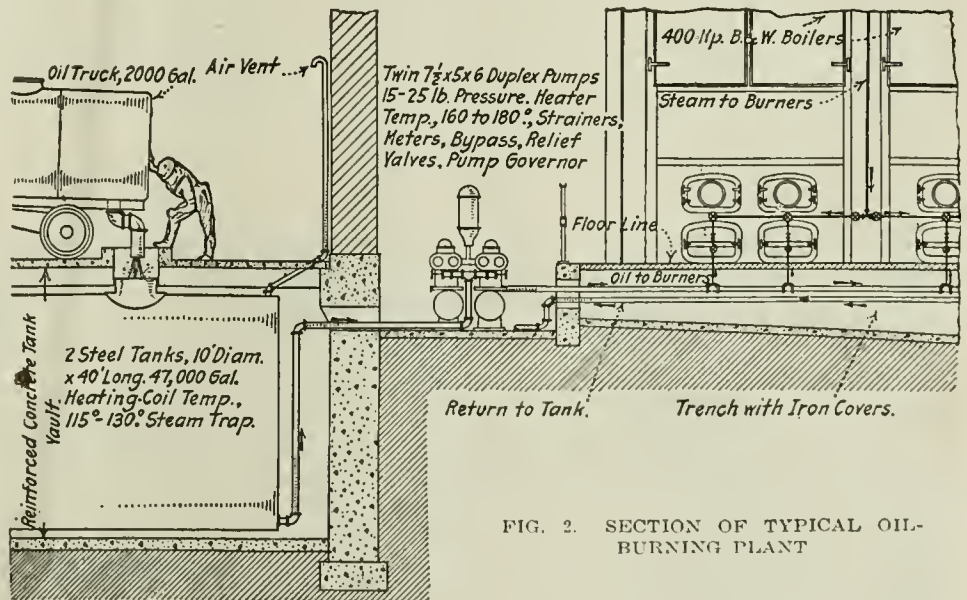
SECTION OF TYPICAL OIL-BURNING PLANT
